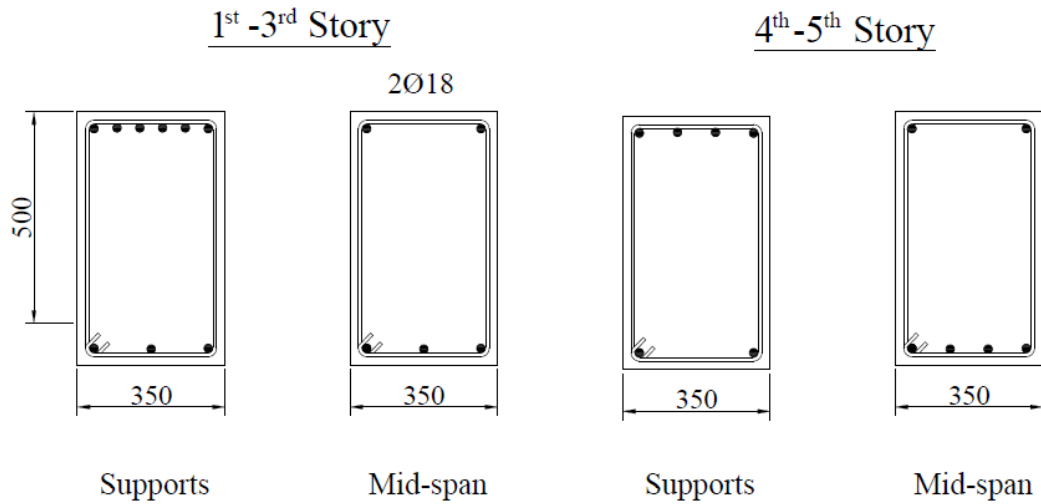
Cross Sections for Beams of 5 Story Irregular Frame
